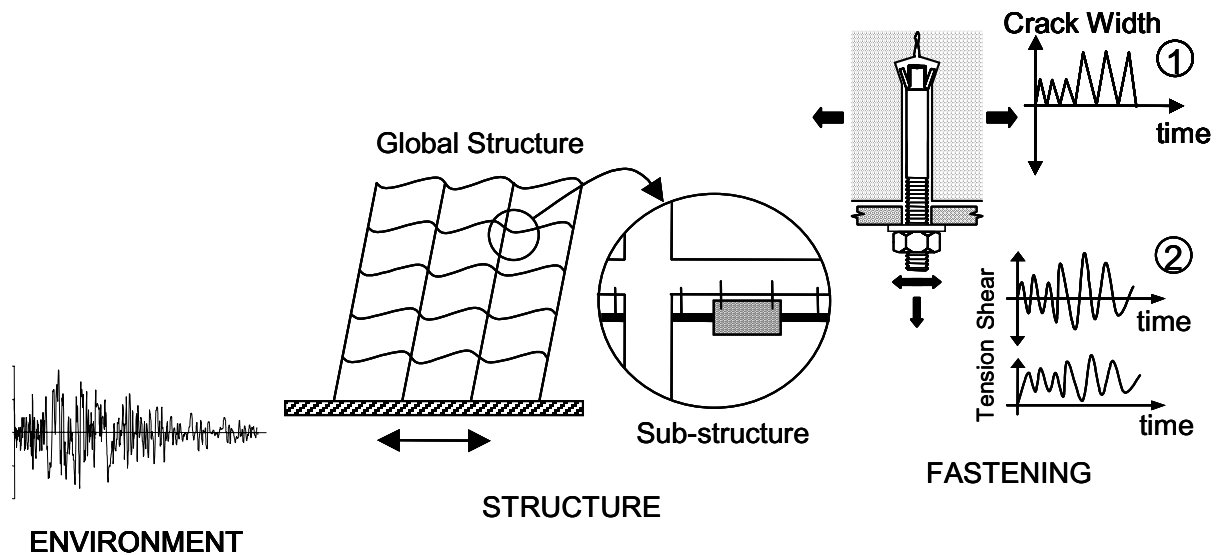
Development of actions on fasteners under seismic loading, [15]
